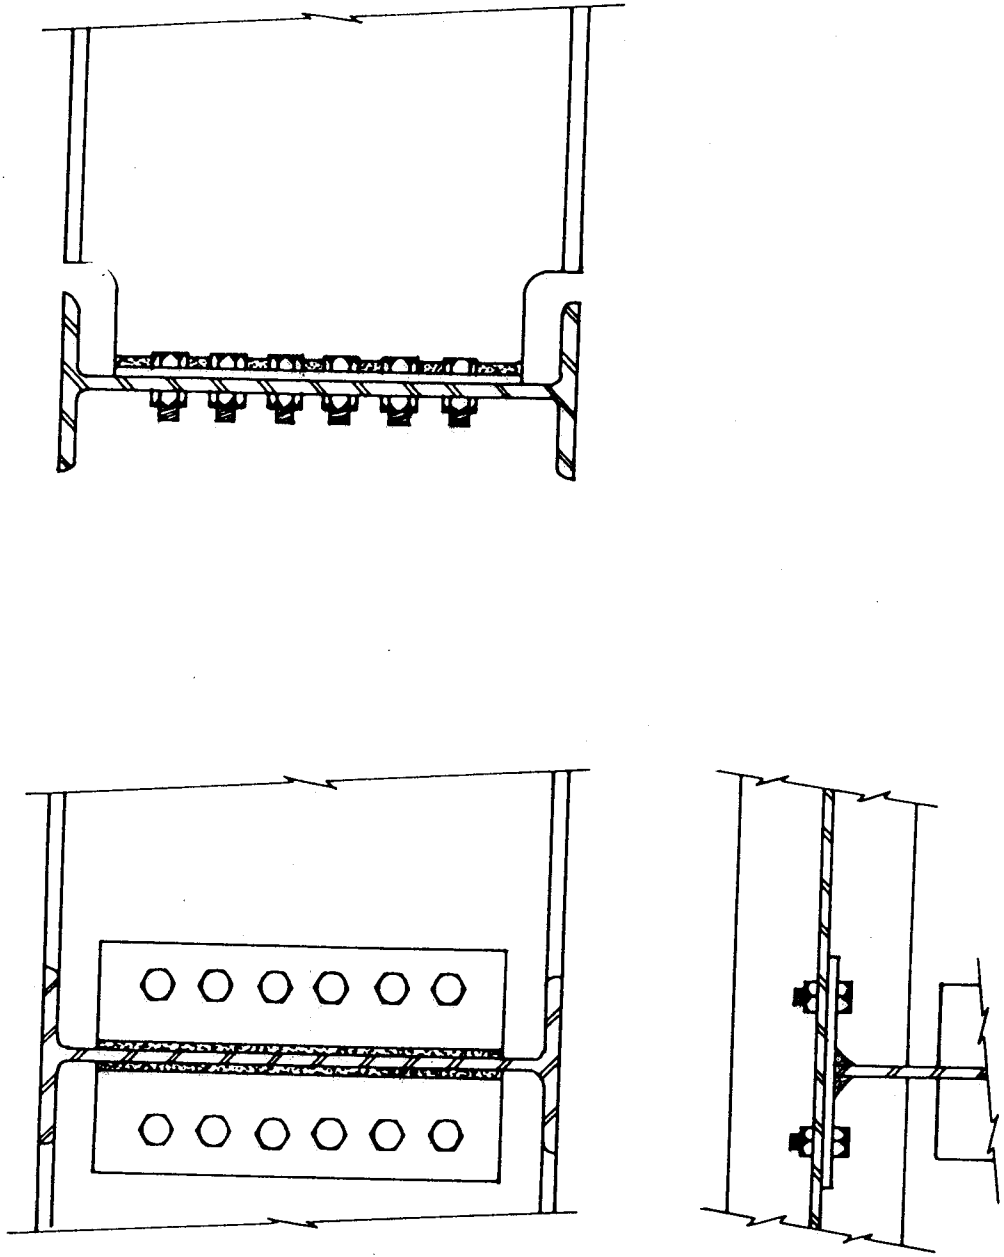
Single Flexible End Plate Connection to Beam Web Detail
